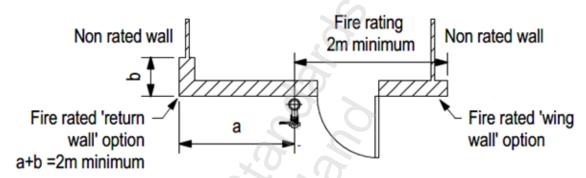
(b) – Non sprinklered building – Hydrant outlet protection Fire rating options at building corners – Plan view
